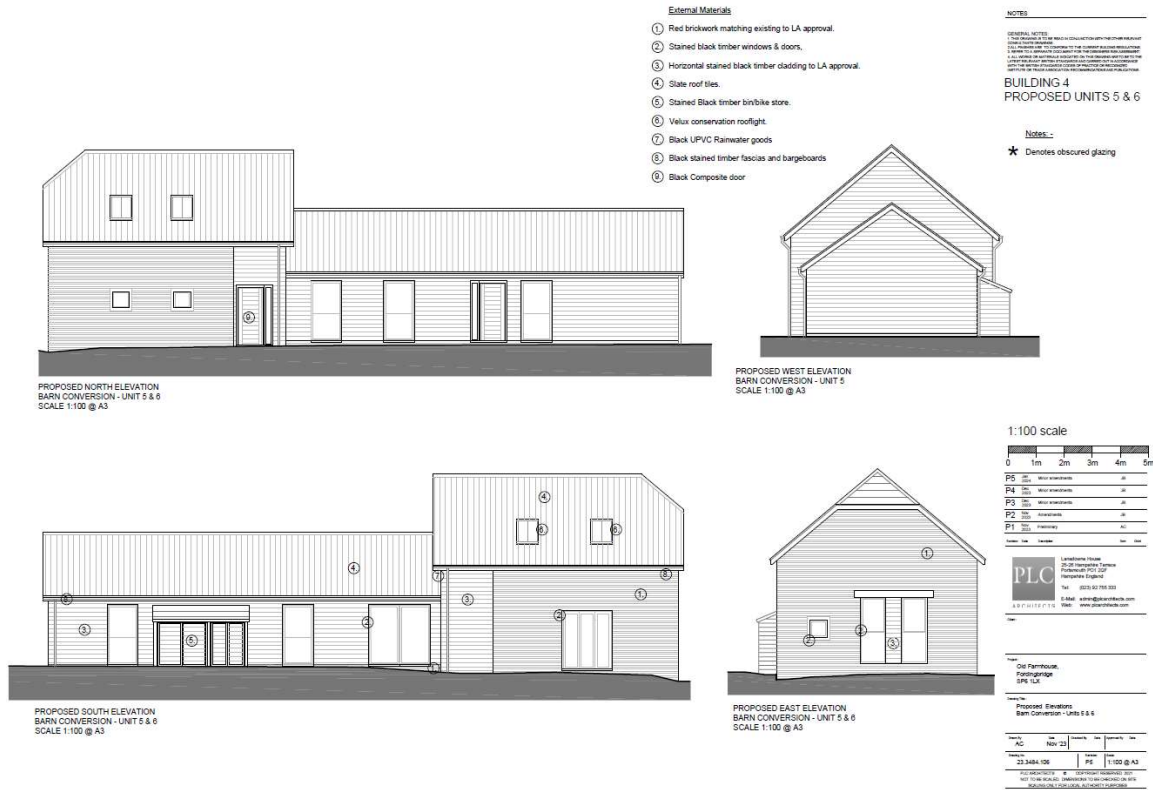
Proposed Elevations – Extension and conversion of Building 4 (units 5 & 6) (Not to scale)
